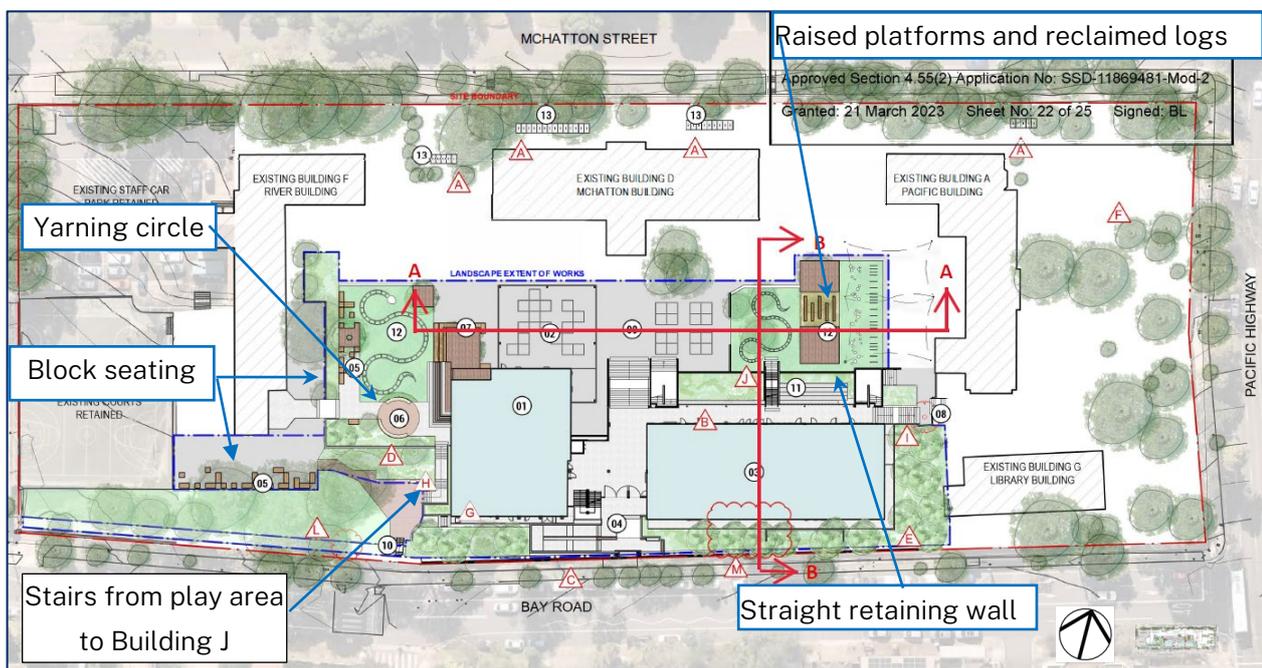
| Approved landscape plan (Base source: Modification 2, 2023)
